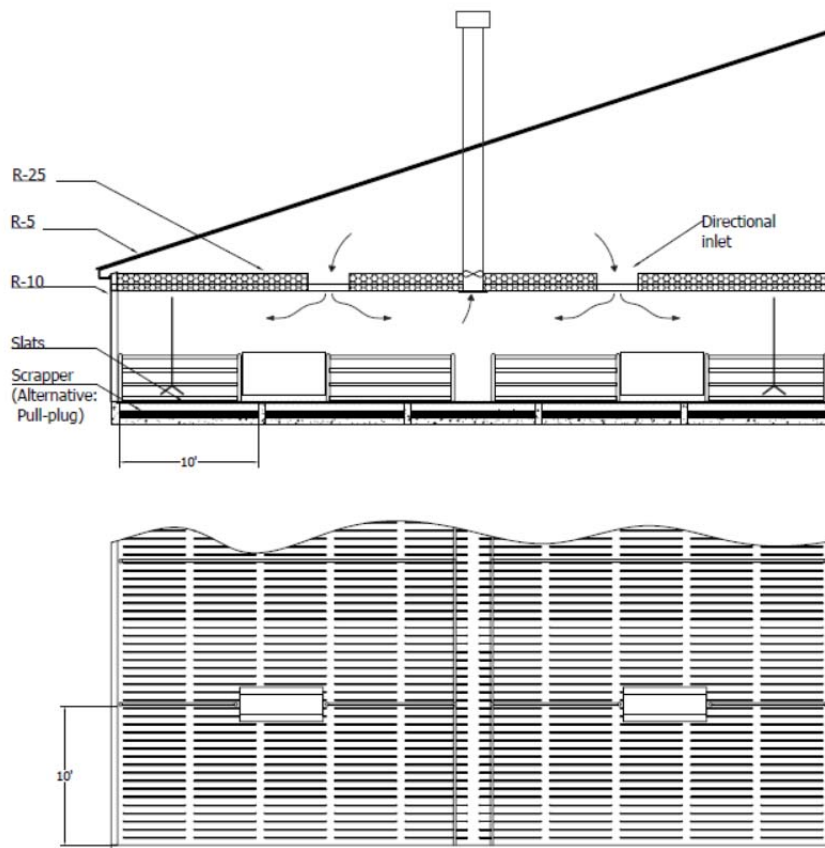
Half section and plan view of GPB C and D, full-slat barns.
